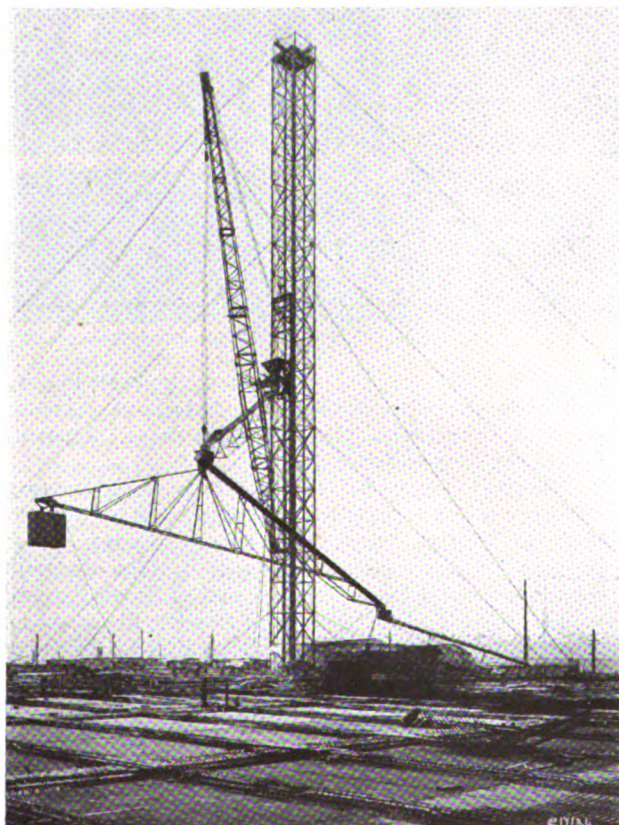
STEEL CONCRETING TOWER WITH BOOM.
